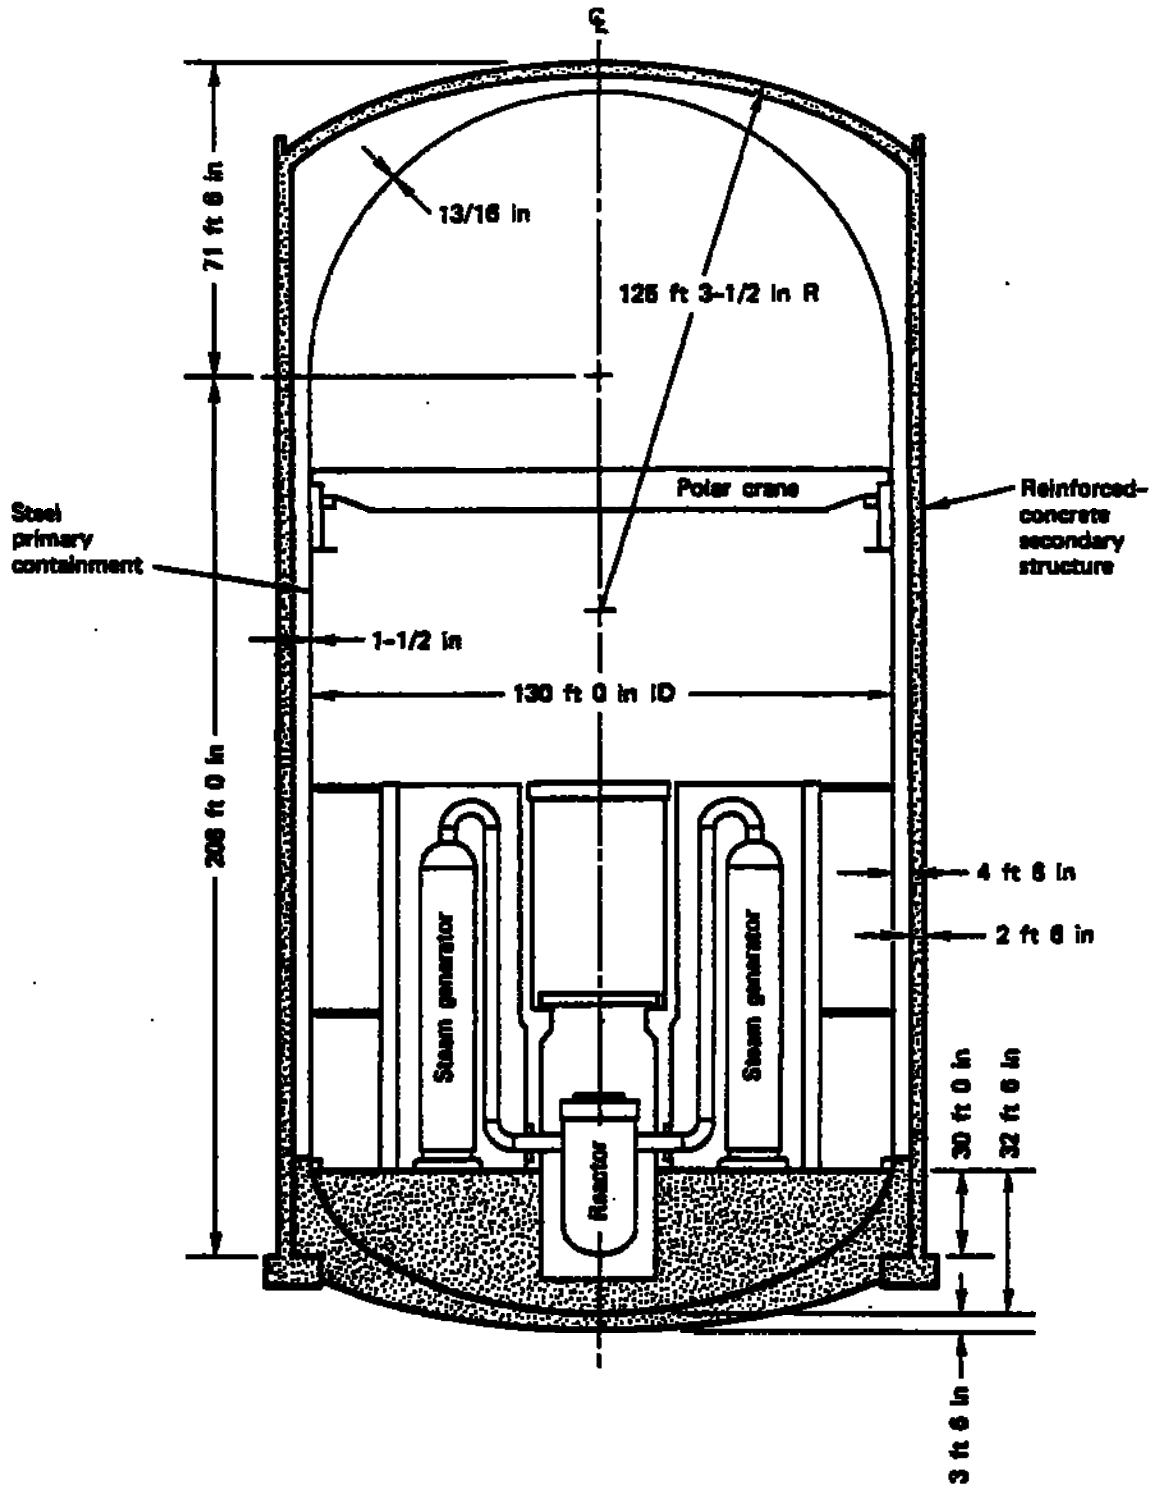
Large Dry Steel Containment with Reinforced Concrete Shield Building (e.g. Davis-Besse)
